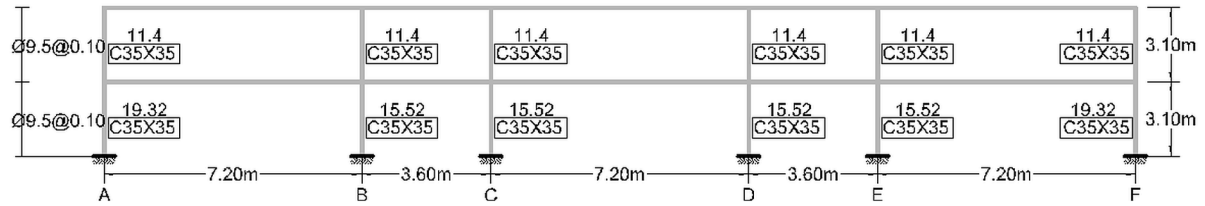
Educational facility, geometry and reinforcement in beams of the Frame 3
